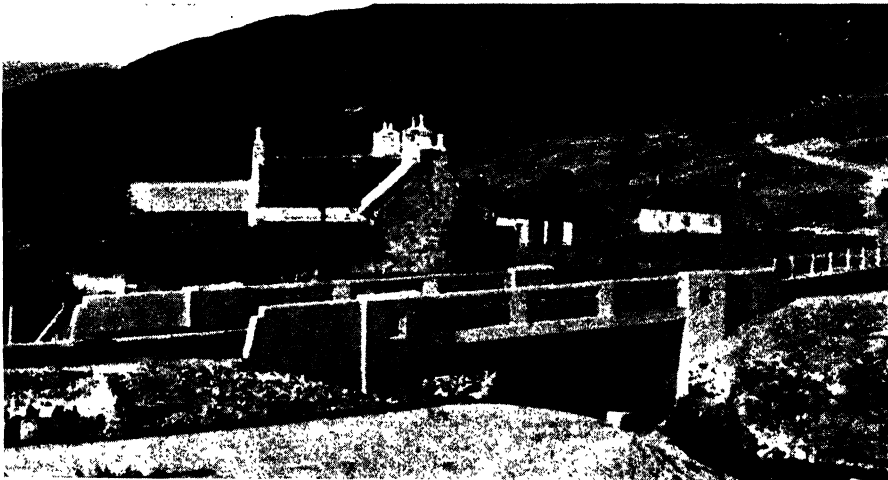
BRIDGE WITH SUPERELEVATED DECK IN ABERDEENSHIRE.
